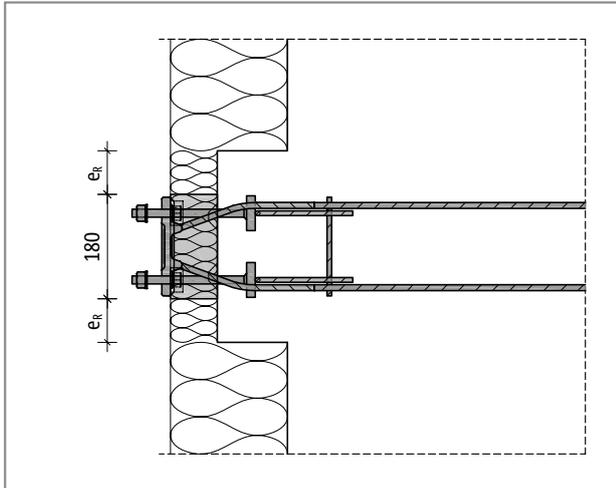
Schöck Isokorb® T type SQ: Edge distances
